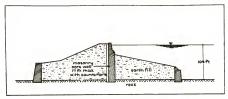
Gross-section at maximum thickness of the St-Ferréol dam, Languedoc canal, built 1667-71.
